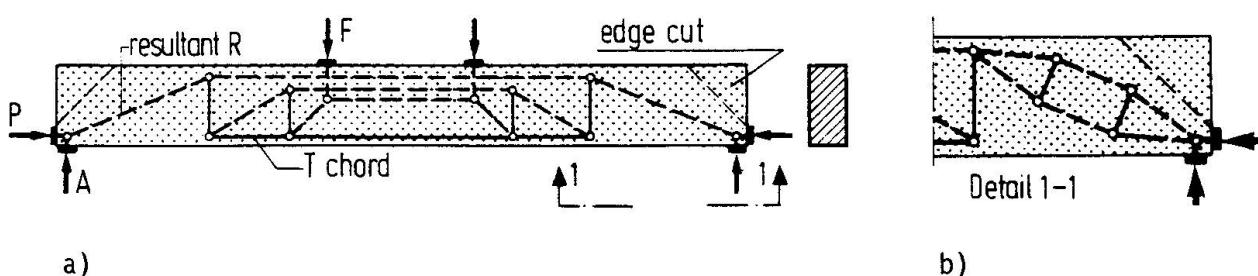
(a) Strut-and-tie-model of partially prestressed beam with rectangular cross section; (b) detailed strut-and-tie-model of the beam area, where the resultant is within the beam section.
